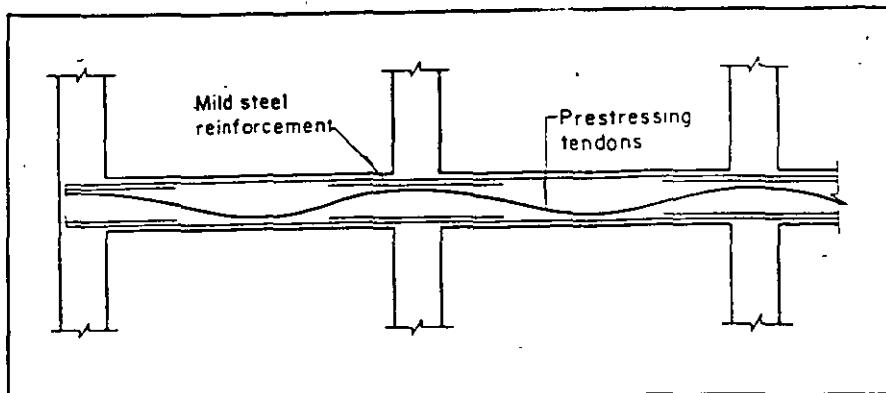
Cast-in-place frames with post-tensioned concrete beams.
